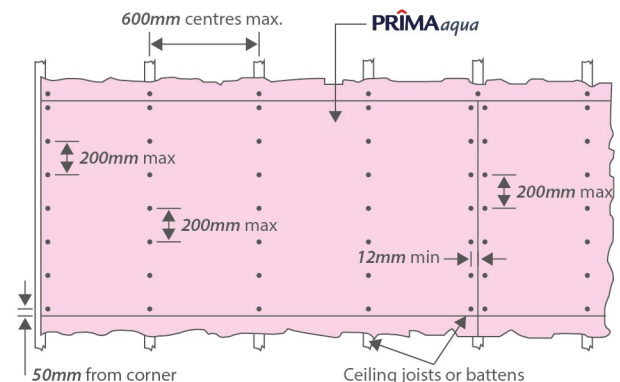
PRIMA^{aqua} Ceiling - Nail or Screw Fixed
